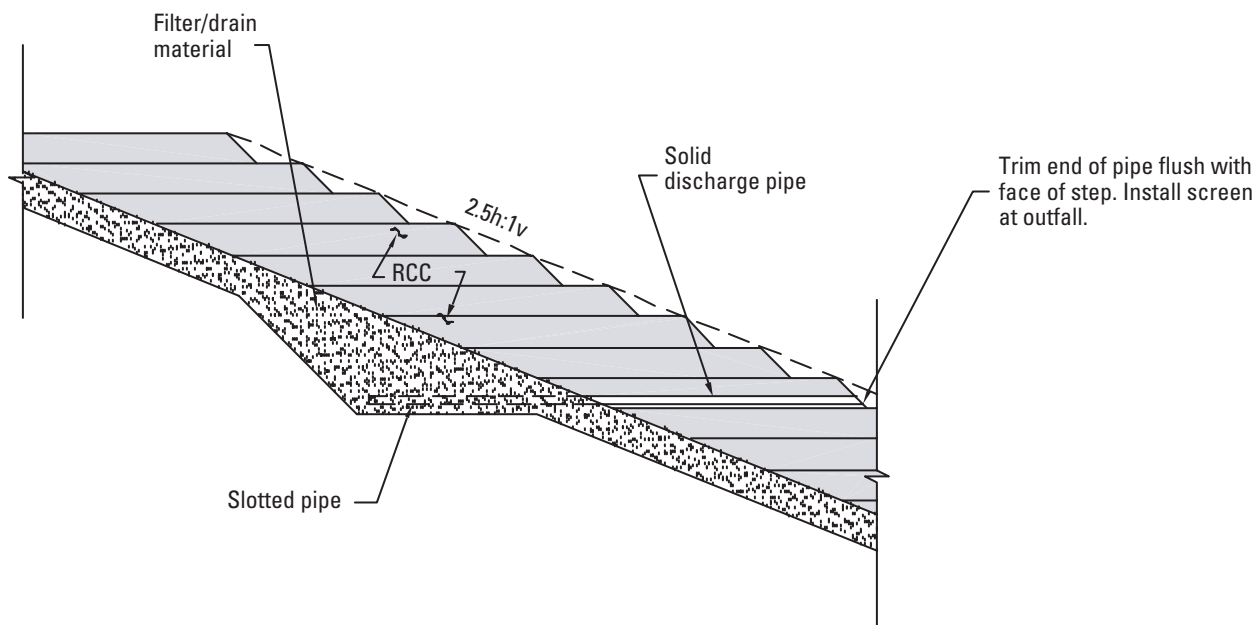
Typical details of an under-drain and outlet pipe.
